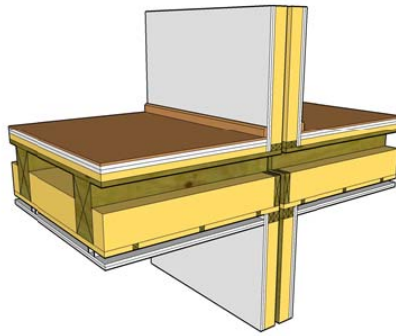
Lightweight wall structure and lightweight floating floor on wooden beams
